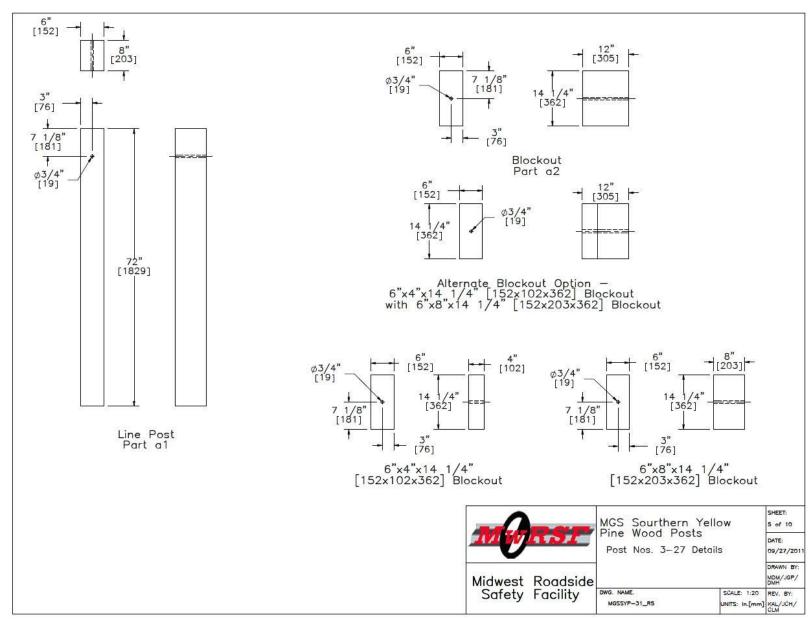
Post nos. 3 through 27 and Blockout Details, Test No. MGSSYP-1
